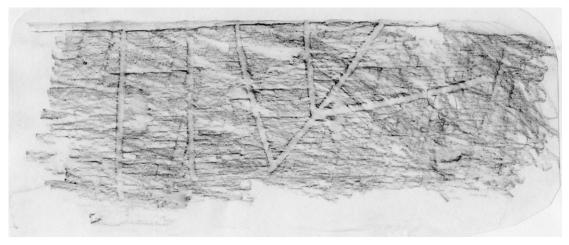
A carpenter's mark on the underside of upper floor joist 5.
